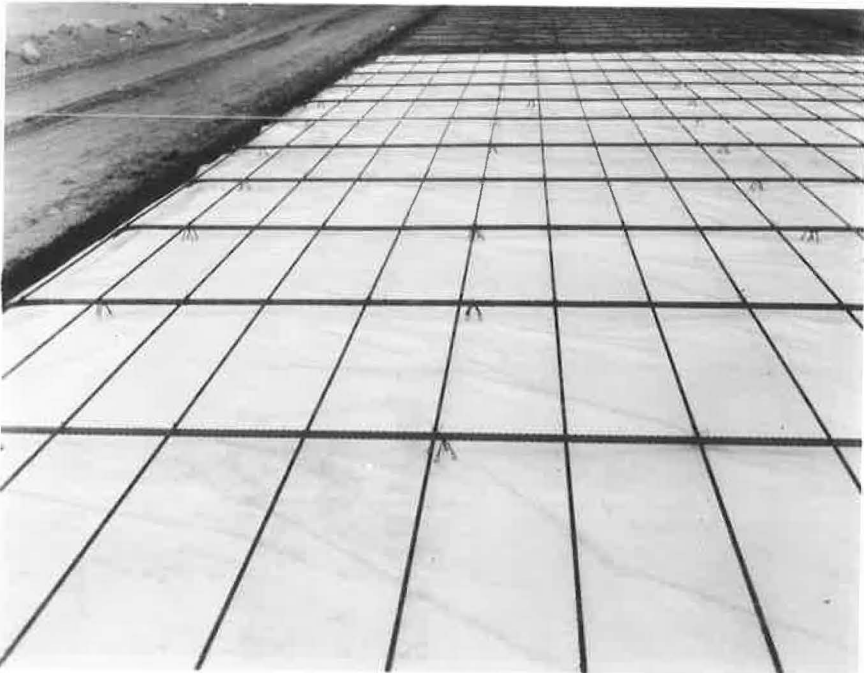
Transverse reinforcement by No. 7 deformed steel bars, tied to longitudinal bars; all steel supported by chairs.
